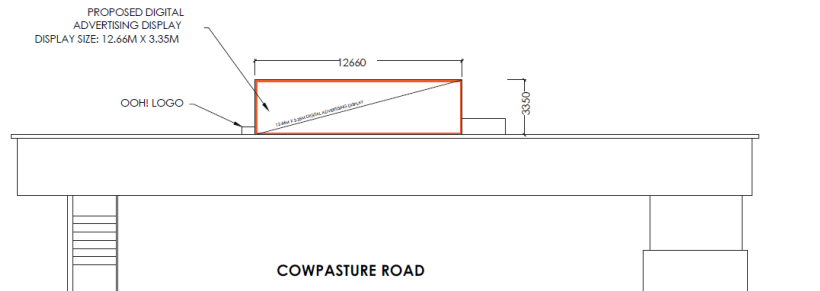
Proposed elevation of billboard and advertising signage structure (Source: oOh!media)
